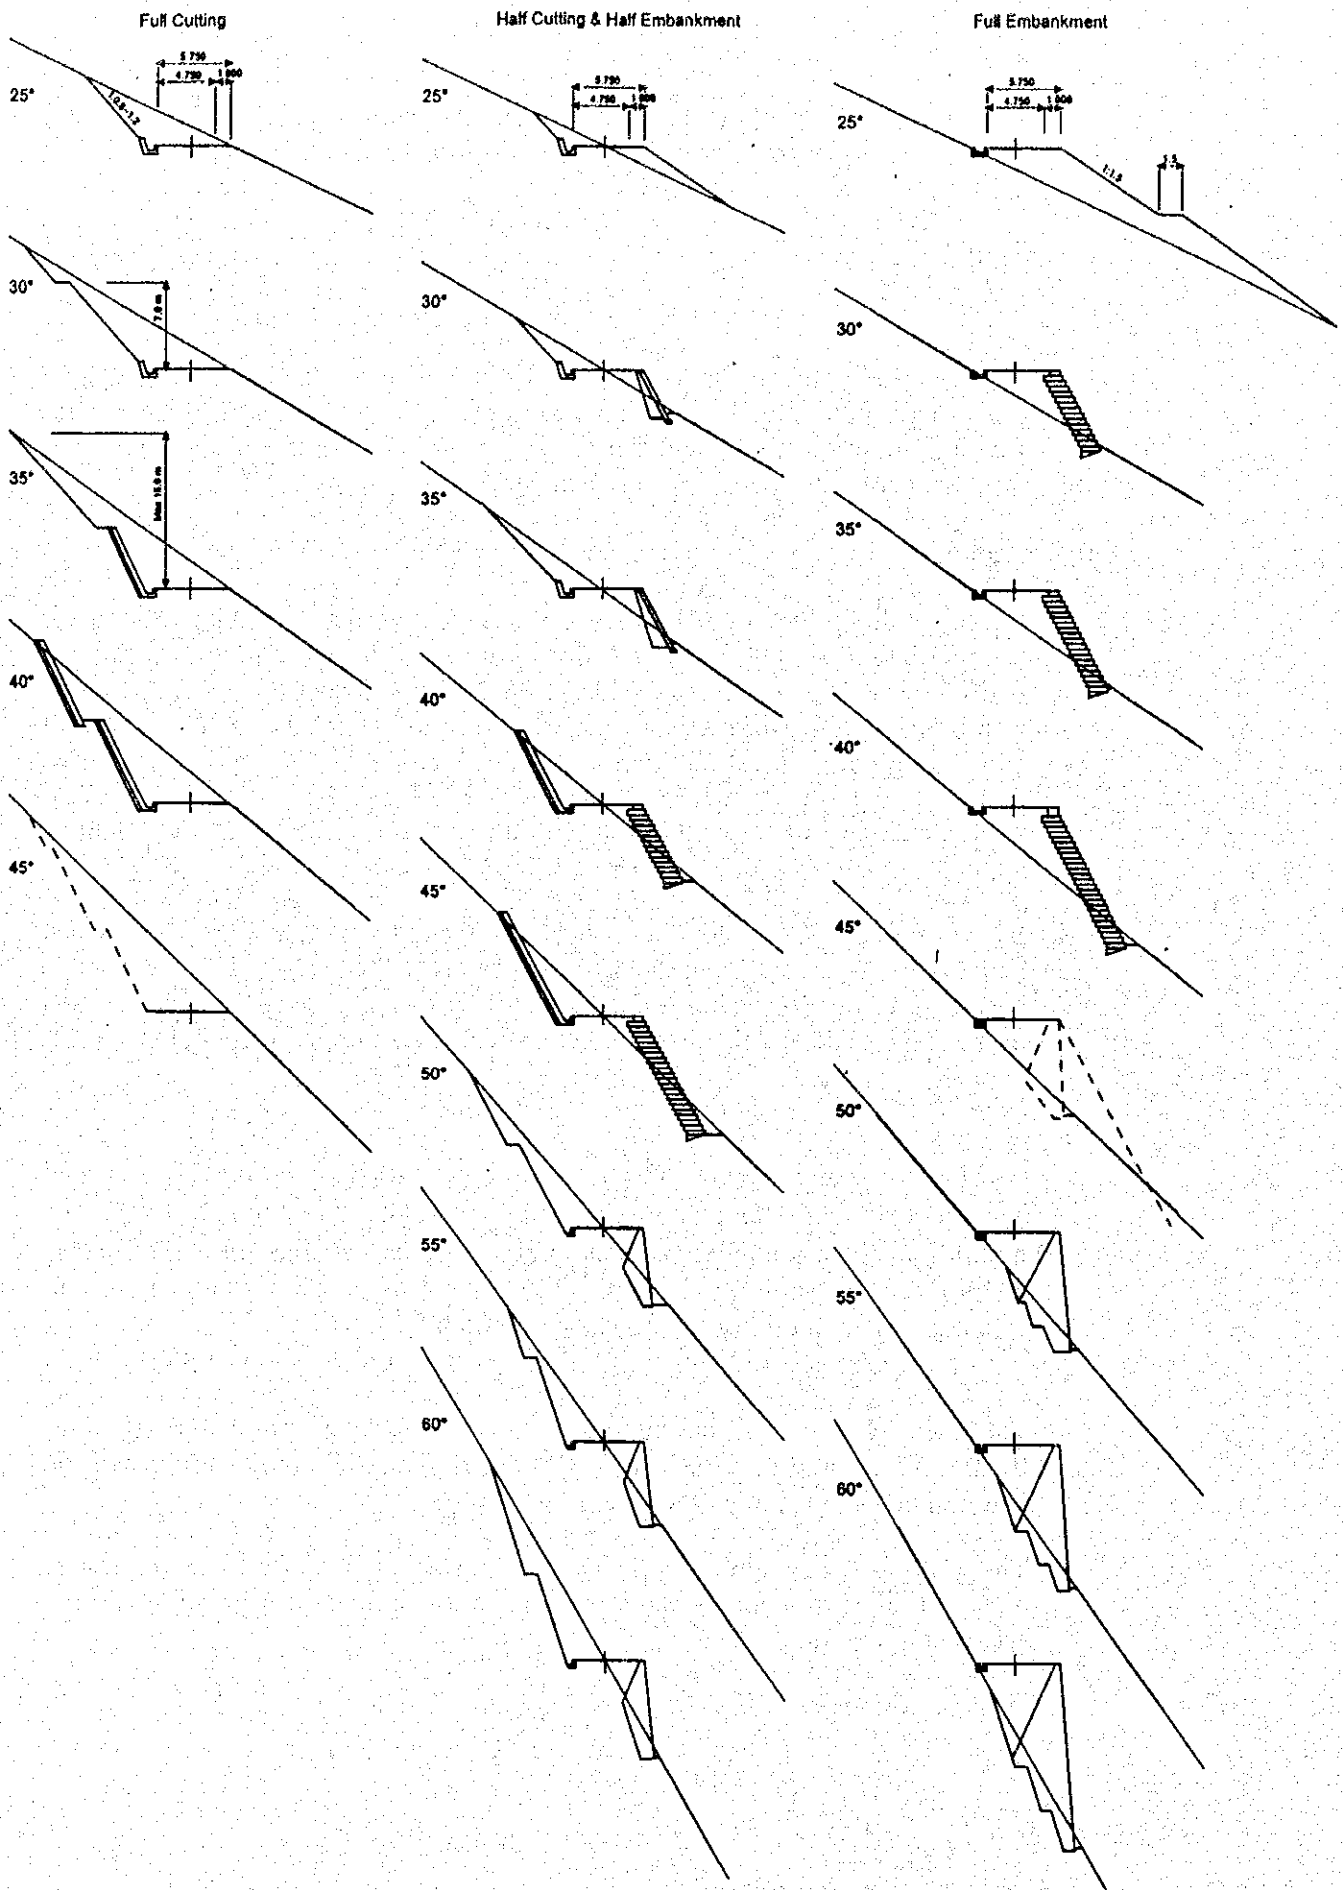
Natural Slope Gradients and Road Cross Sections
